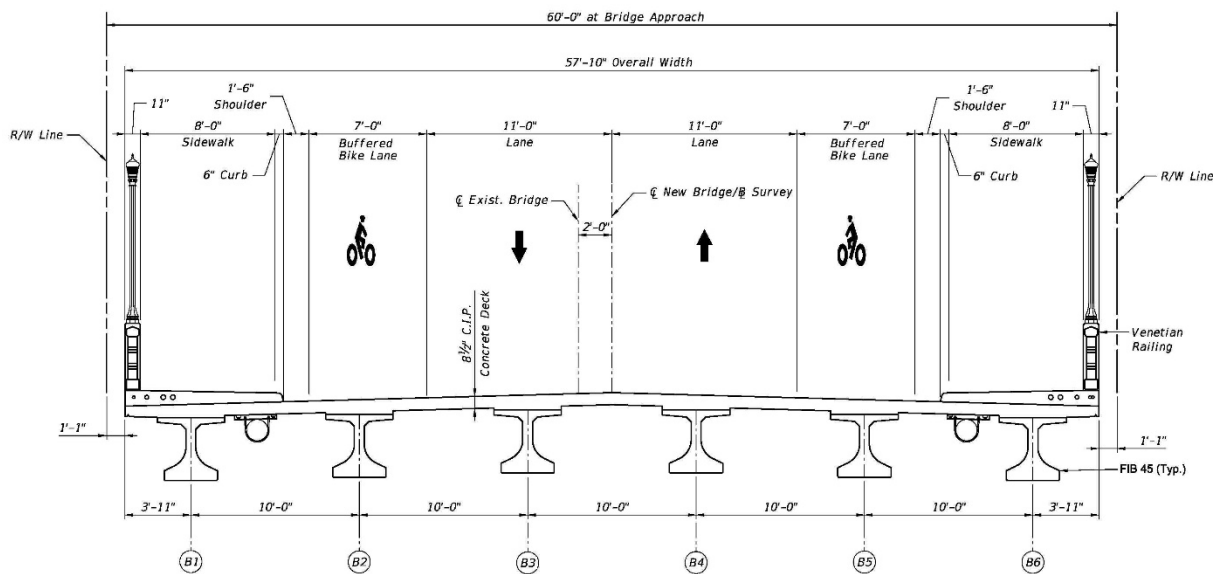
Replacement Alternative 6 – High-Level Fixed Bridge Typical Section
